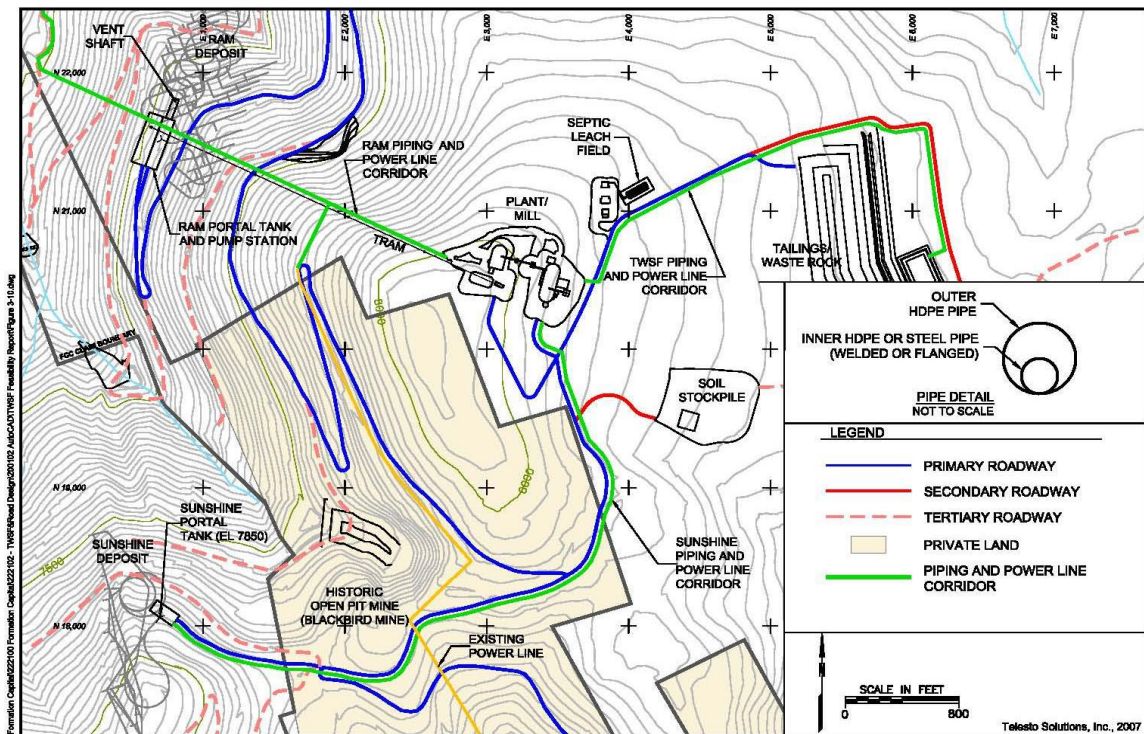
Mine Dewatering System Piping and General Arrangement
